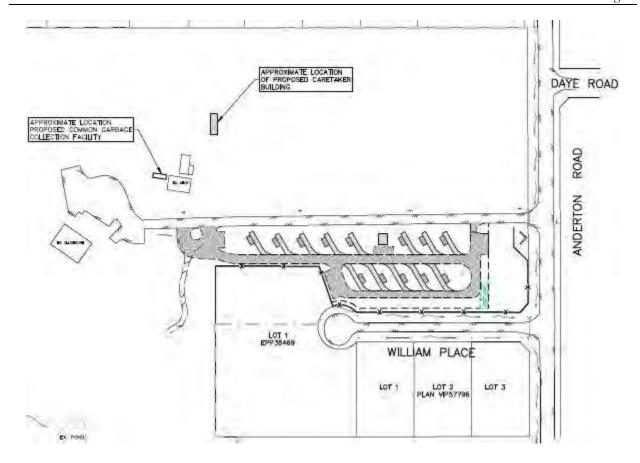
Site Plan Cropped to Show Proposed RV Campground, Caretaker's Residence and Waste Receptacle
